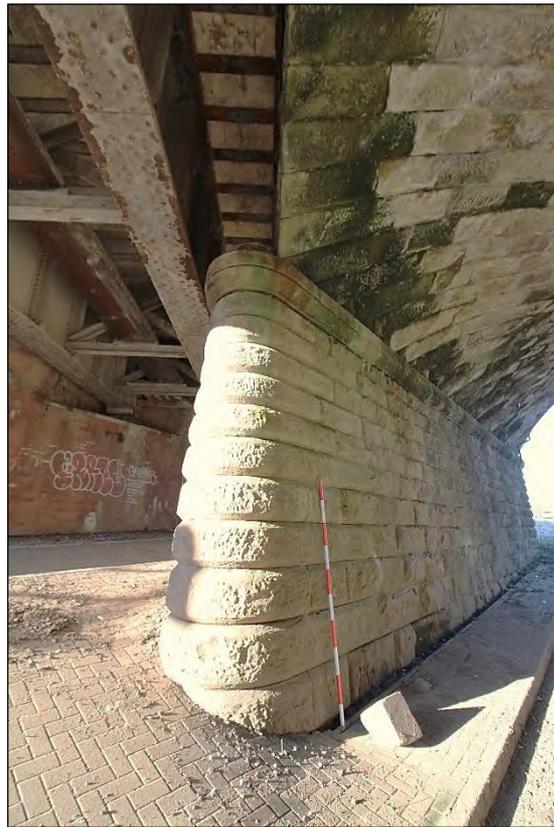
Span 4, displaying the curved pier and underside construction joint of ashlar and steel, 2m scale
